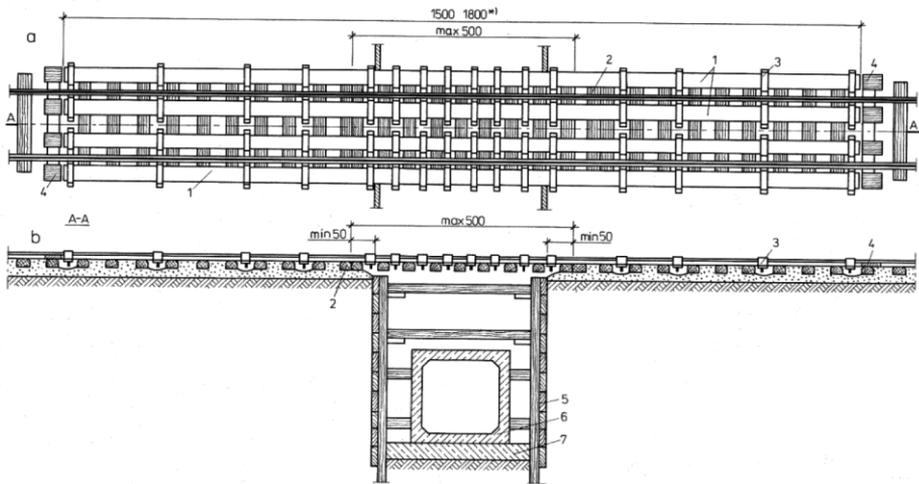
Scheme of a rail relief structure for a concrete culvert reconstruction (Miklin & Sawicki, 1993): a - top view, b - cross-section through the reconstructed culvert, 1 - rail bundles, 2 - support sleepers in the obstruction zone, 3 - steel ties (chinstraps), 4 - timber blocks at the ends of the relieving structure, 5 - excavation formwork, 6 - reconstructed culvert structure, 7 - culvert foundation
